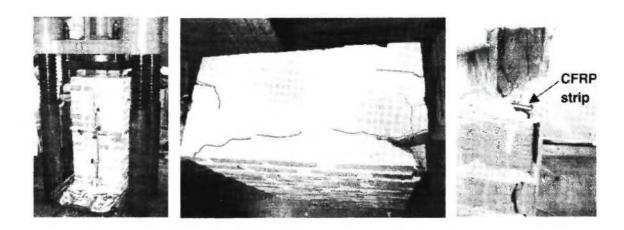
Specimen under the hydraulic press (1000 tons). Specimen base typical failure pattern. Detail of the corner failure.
